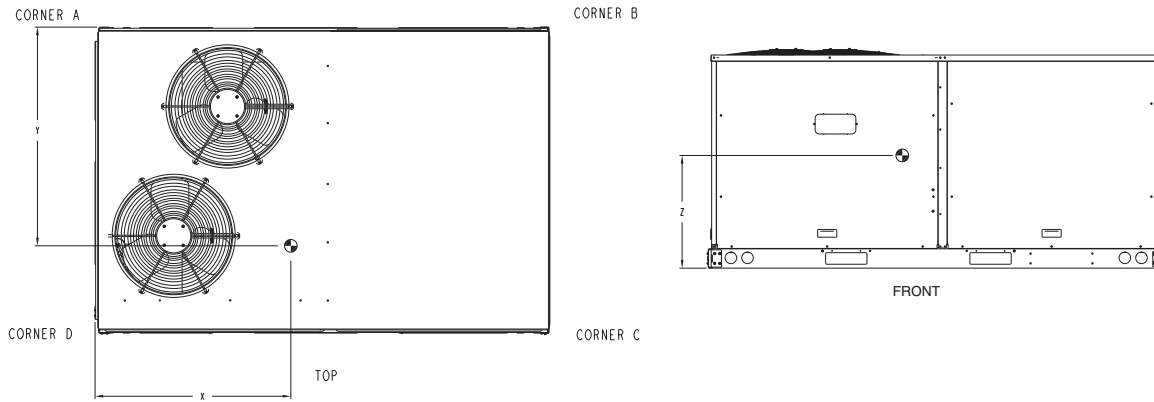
Dimensions RAS 090-121 (Sheet 2 of 2)
